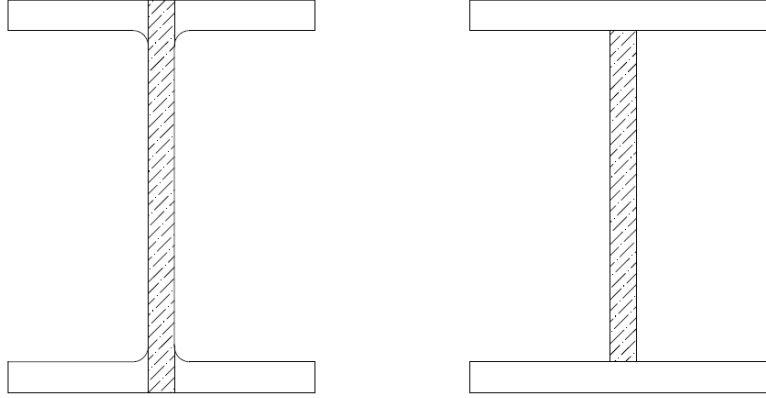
Shear area for a) Hot-rolled sections b) Welded sections
